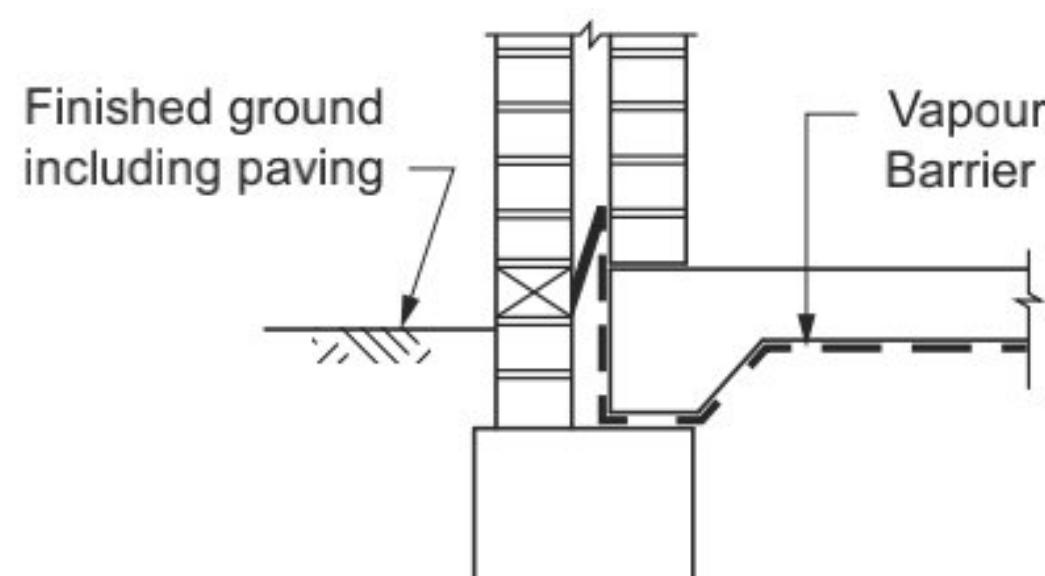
Acceptable vapour barrier and damp-proofing membrane location
